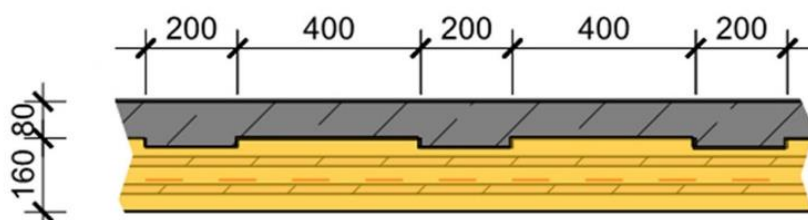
TCC floor build-up. From “Haut - A 21-storey Tall Timber Residential Building”, by R. Verhaegh et al., 2020, *International Journal of High-Rise Buildings*, 9(3), p. 217.
